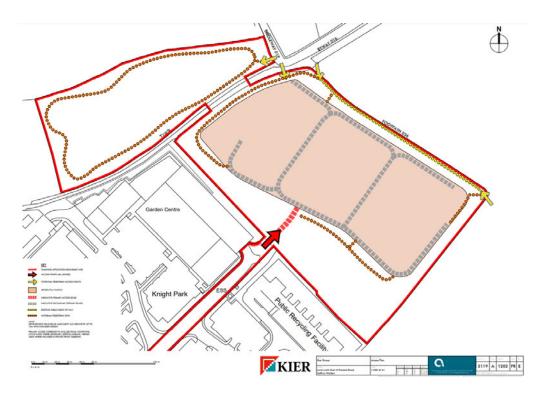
Access Plan (Source: Kier drg. no. 3119-A-1202-PR-E)
